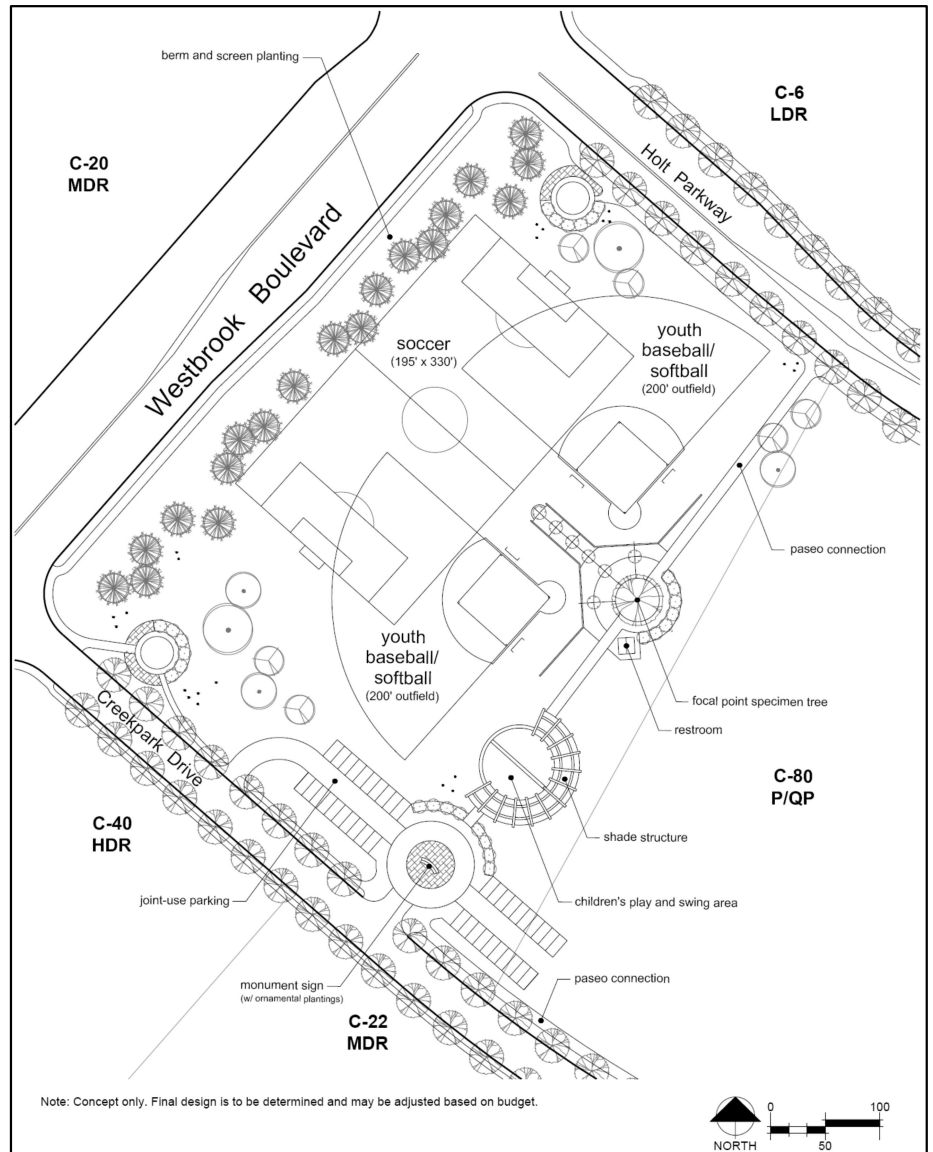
Concept Plan for Neighborhood Park/School (C-60)
